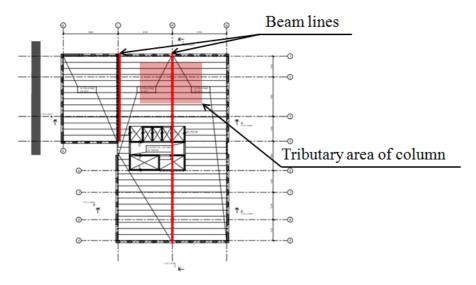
Floor plan with beam lines and the largest tributary area in the reference building.
